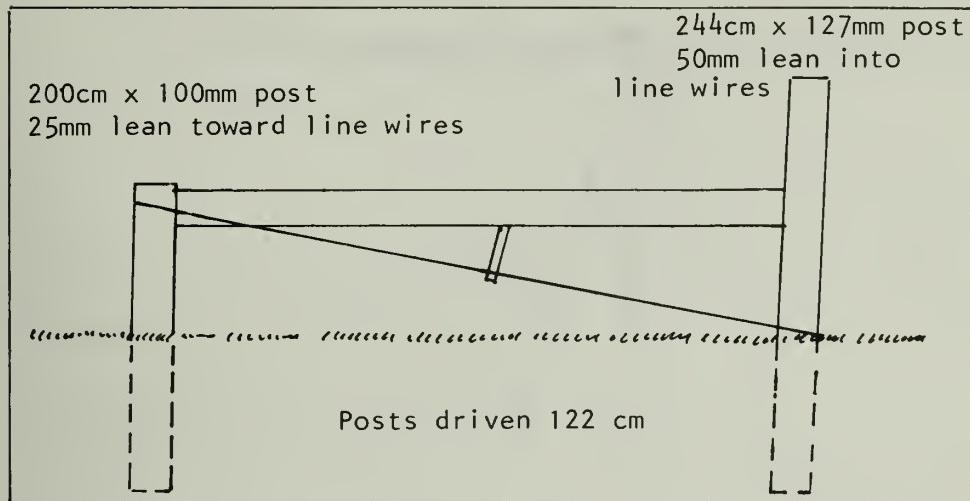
Medium Corner Brace Assembly (Fig. 30) Showing Construction
